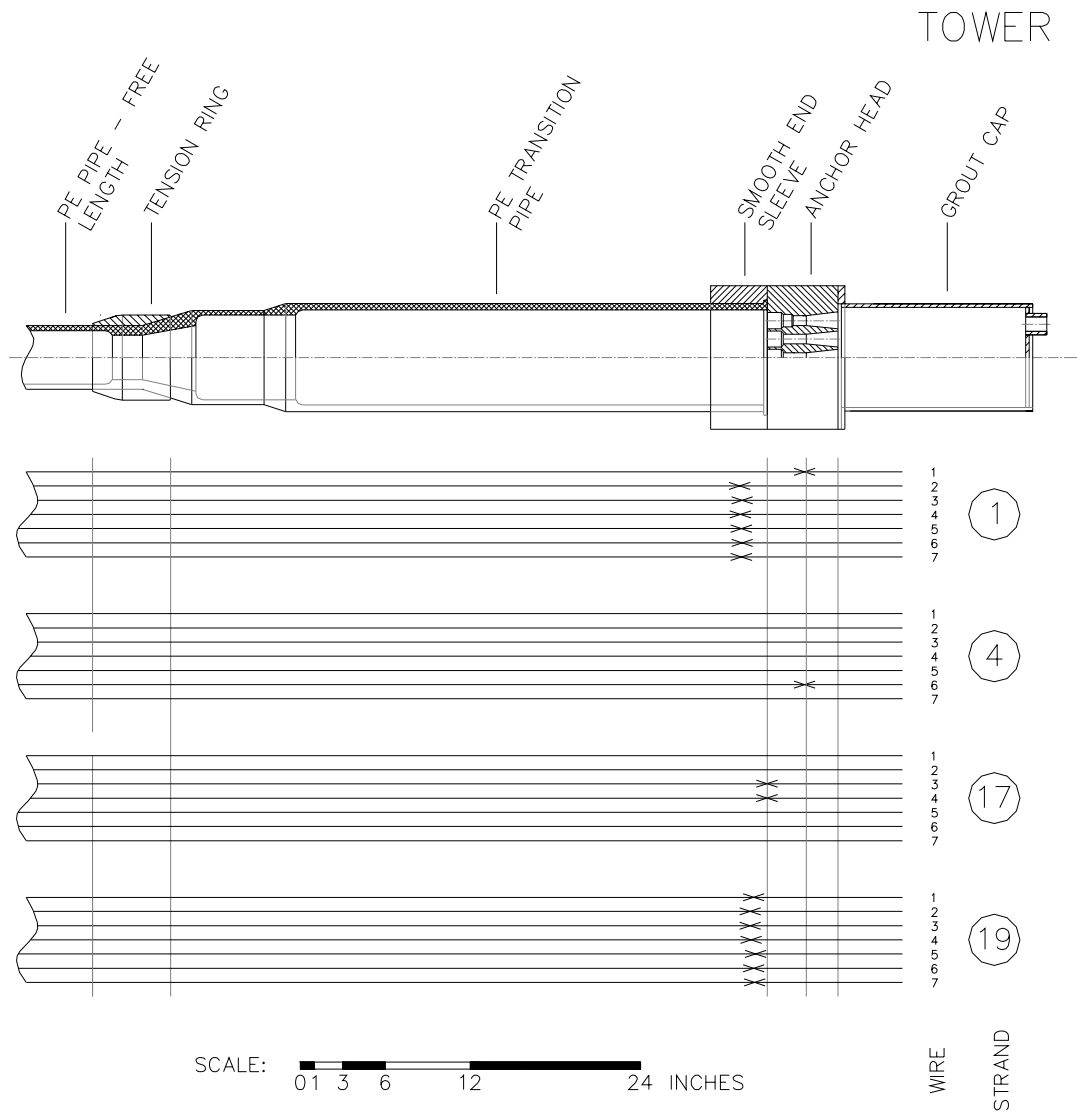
Location of wire breaks near tower anchorage of Specimen 6
